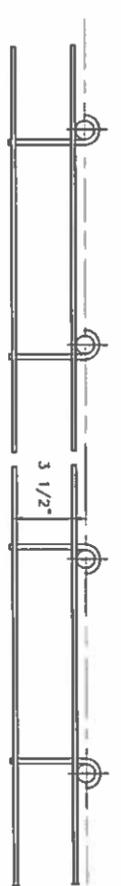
DETAIL OF JOINT FILLER IN EXPANSION JOINT
